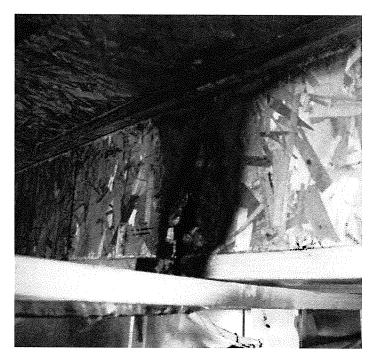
Photograph of the fire damage to the I-joist above the basement bedroom ceiling.⁶
